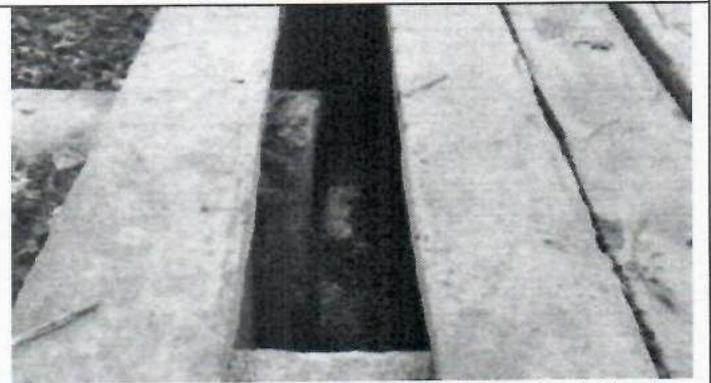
Bypass of untreated Effluent through Closed Circular Channel
